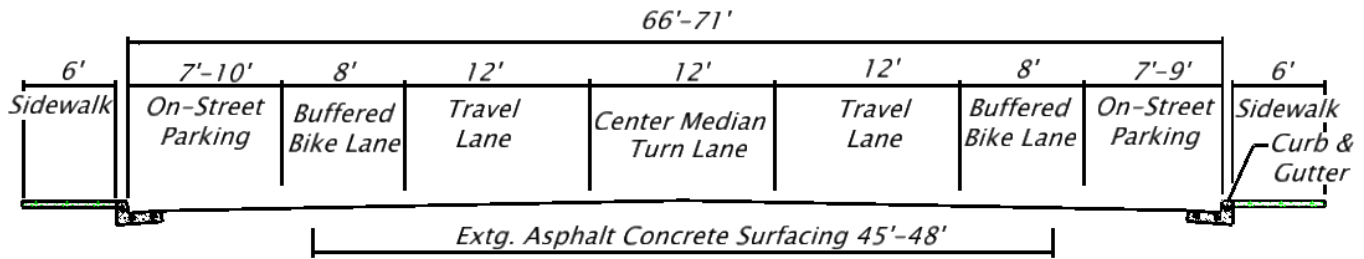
KN 18751 Halsey, OR99 Proposed Cross-section, Widening for Buffered Bicycle Lane, On-Street Parking and Sidewalk
